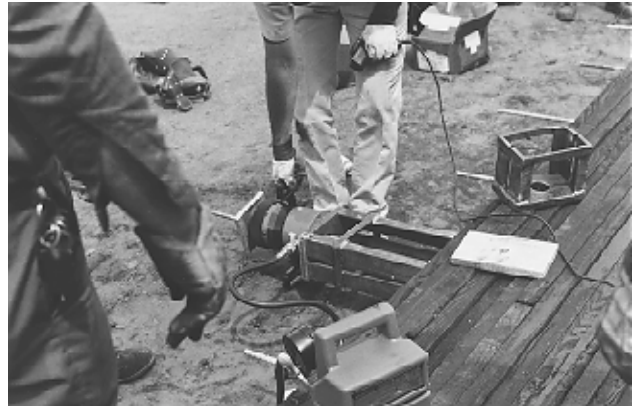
High strength steel bars were tensioned using a single hydraulic jack, electric pump, and steel chair.
